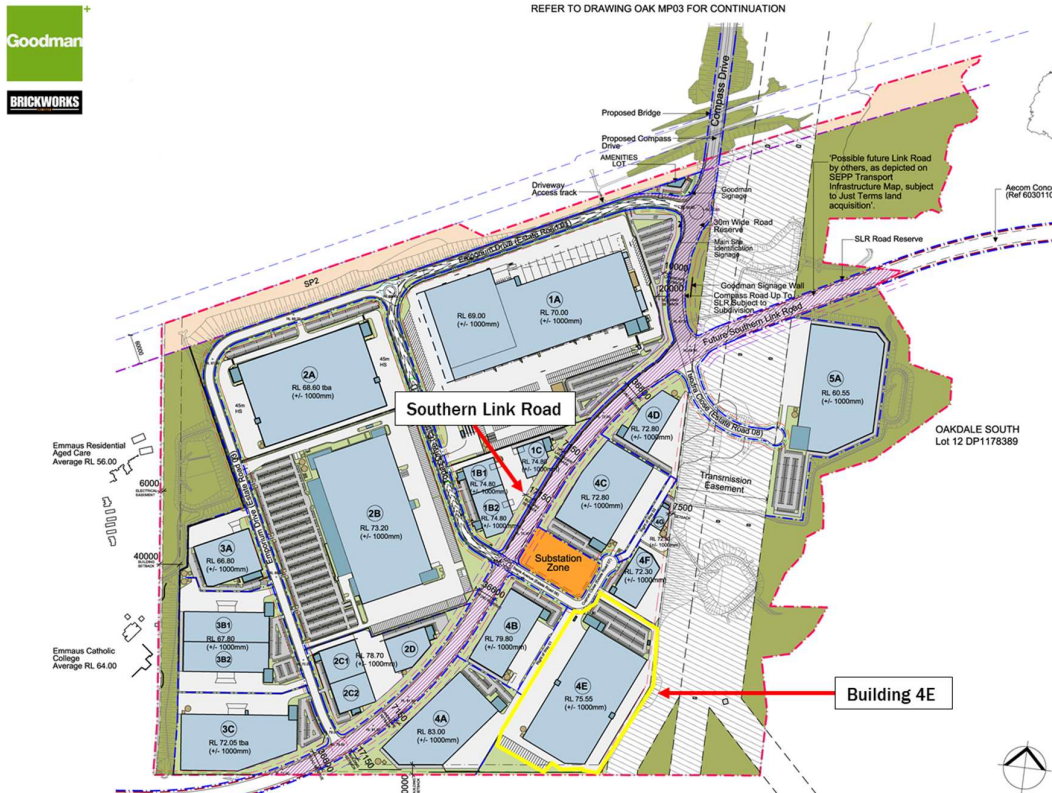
OWE and Building 4E subject to the proposed development (Source: Goodman)
